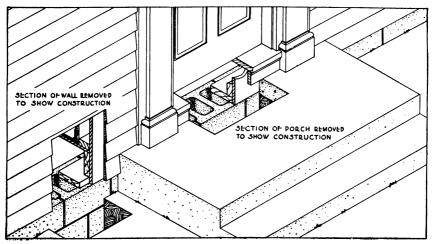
Construction without special protection at porch. Termites may gain access to the woodwork of a building directly from the fill material or soil beneath such entrance platforms and through voids and settlement or shrinkage cracks in a masonry wall.
